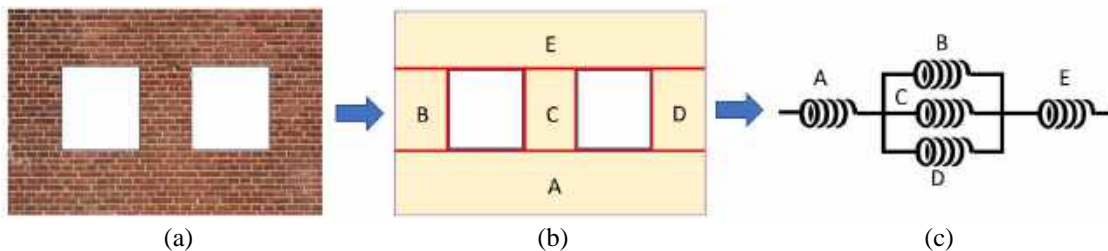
(a) A perforated URM wall, (b) dividing the wall to the spandrel and piers, and (c) composite spring model of the wall.
